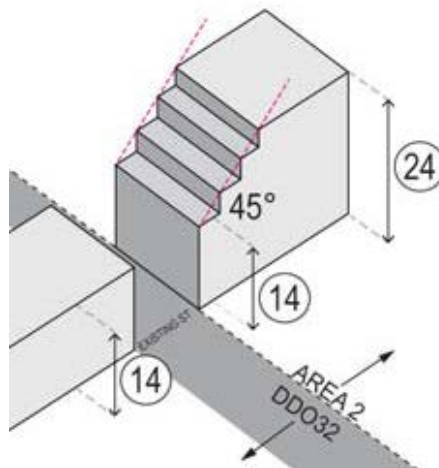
Indicative built form for sites in Area 2 adjoining existing Area 32 (mandatory 14 metre height limit area)
